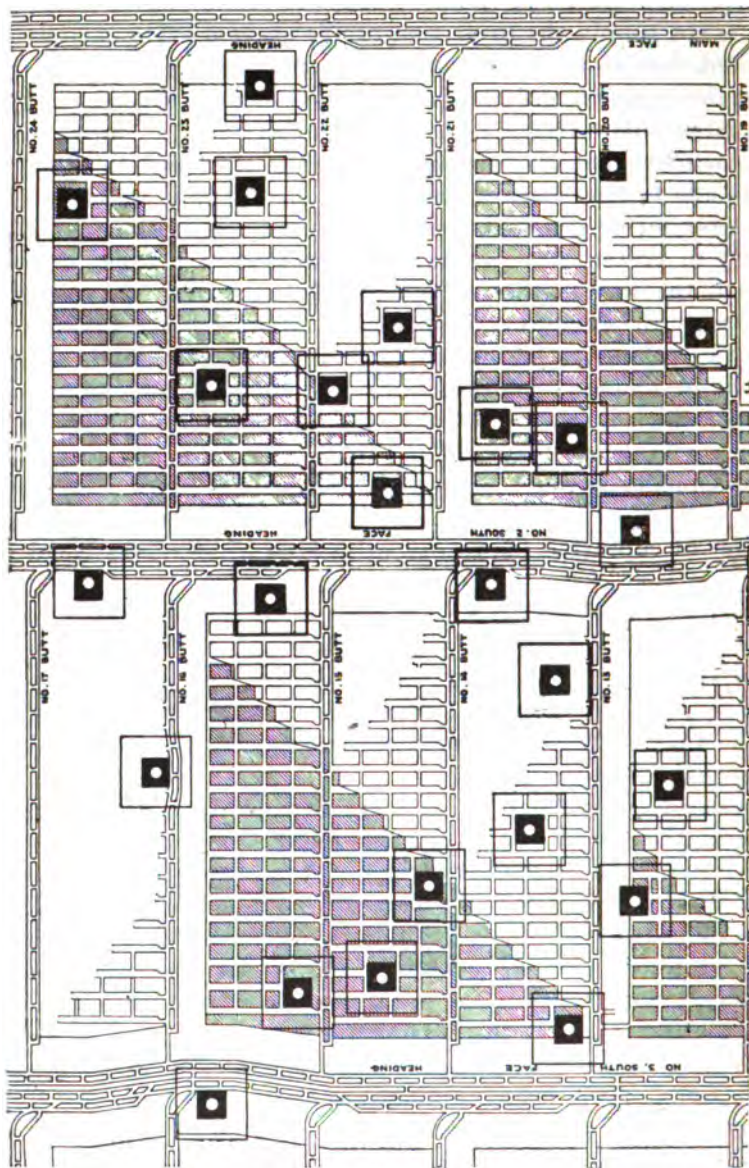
Projected plan of mine workings with gas wells surrounded by pillars of coal.
